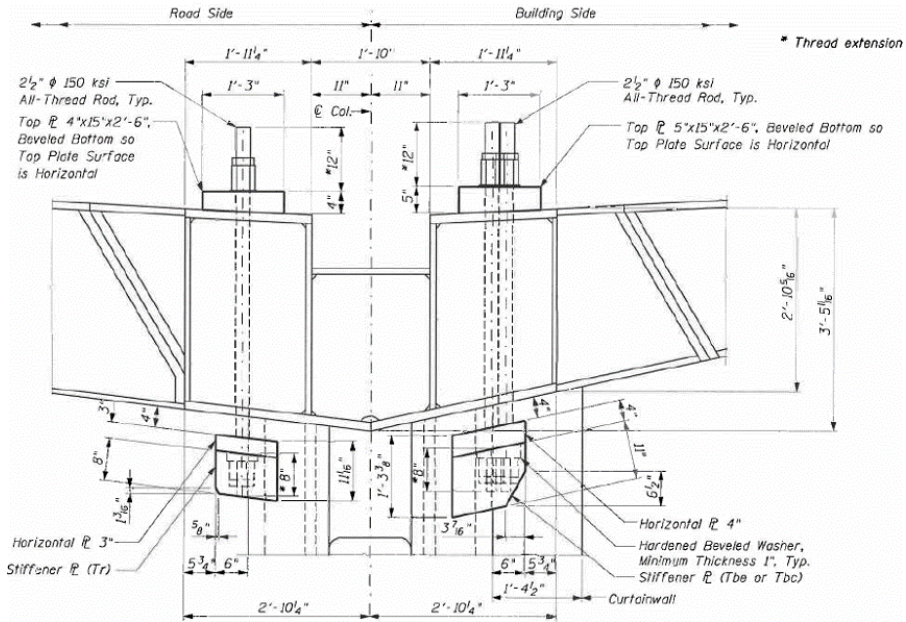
Column to box girder - Weld 6.2 connection retrofit
